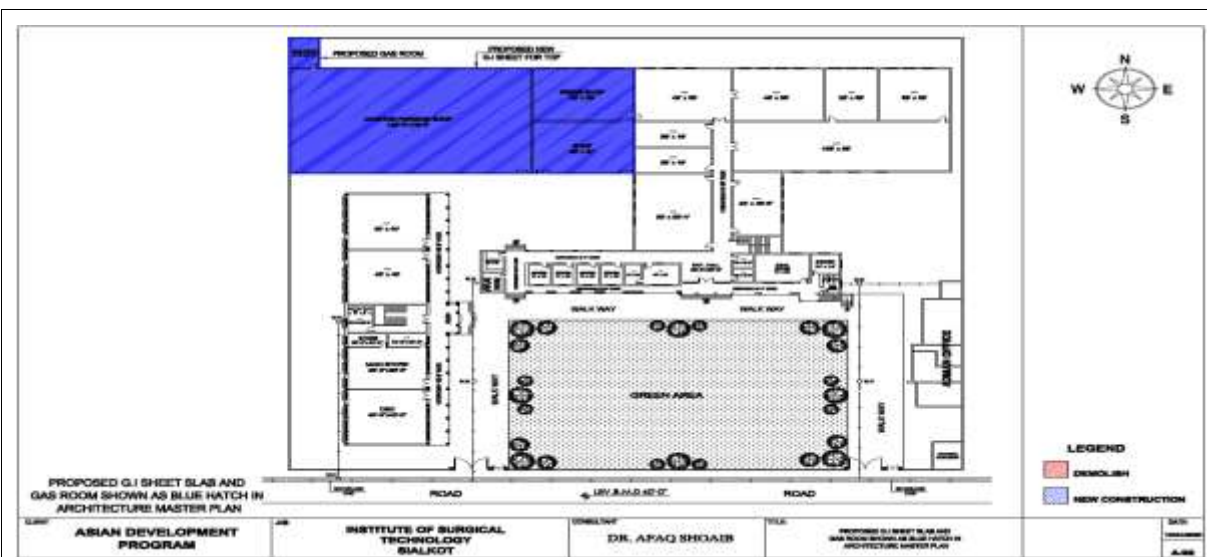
A: Designed layout for (Roof Slab and Gas room) GIST Sialkot
